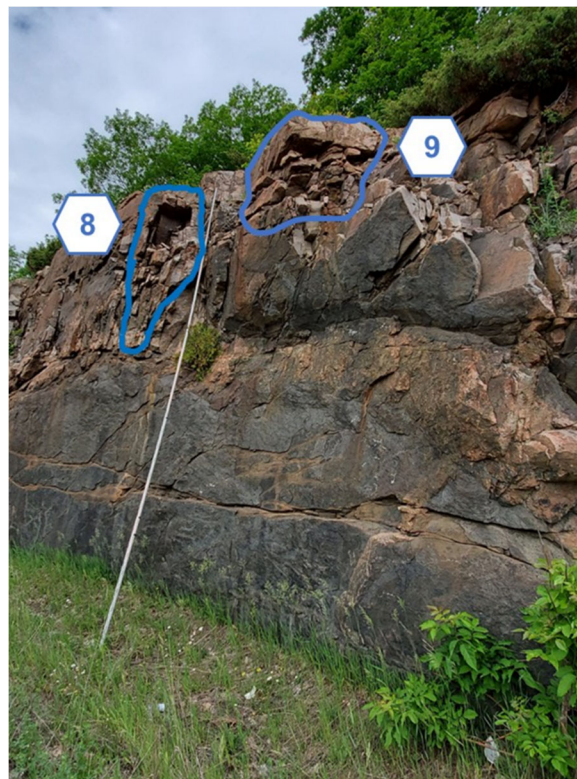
Existing Rock Cut Site 17-3, near 12+355 Left (2020/06/09)
